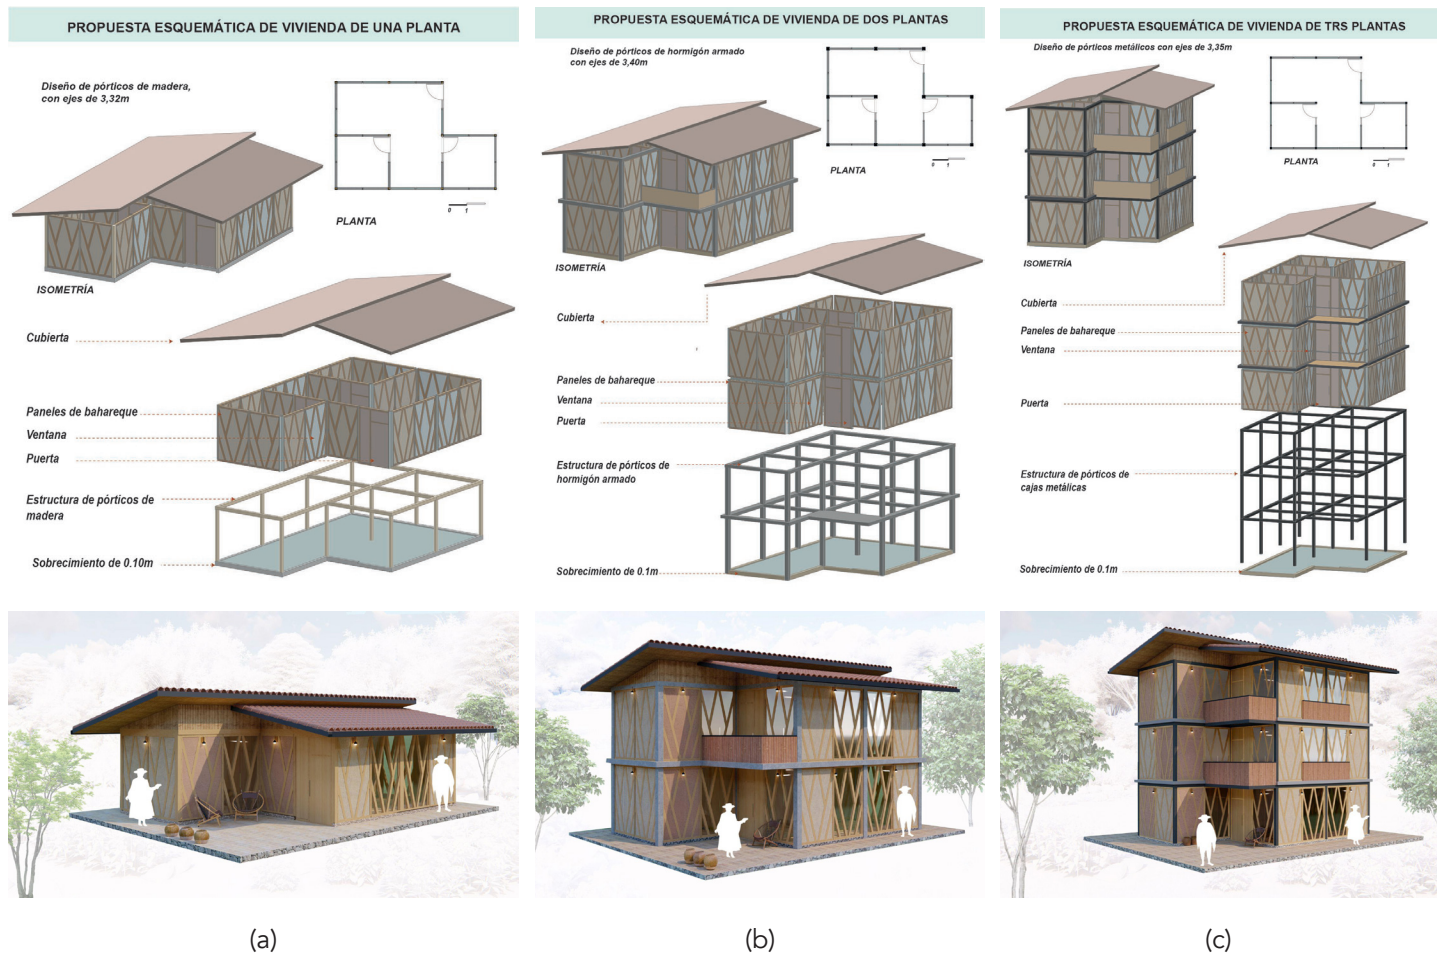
Schematic application of panels (a) Single floor house; (b) Two floor house; (c) Three floor house. Source: Preparation by the Authors.
